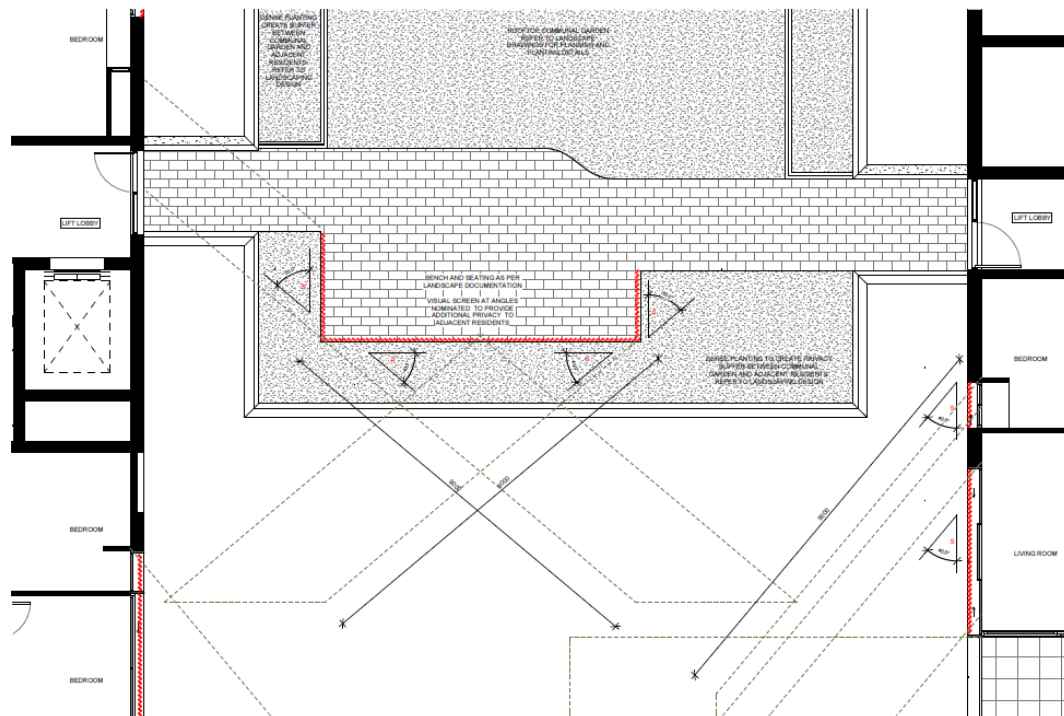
Similar screening proposed on Level 5 roof terrace to prevent overlooking to nearby windows
